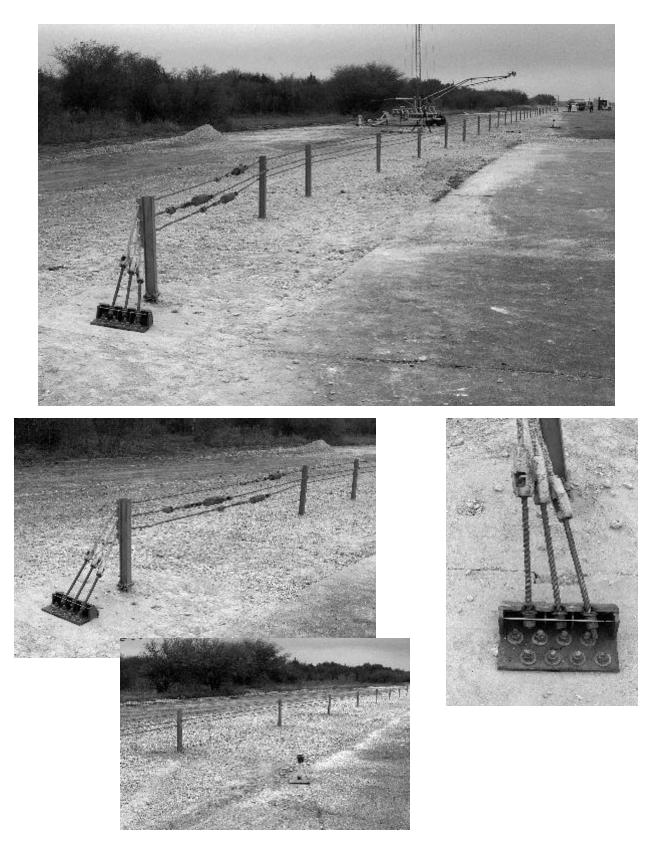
Washington 3-strand cable barrier with New York terminal prior to test 404211-8.
